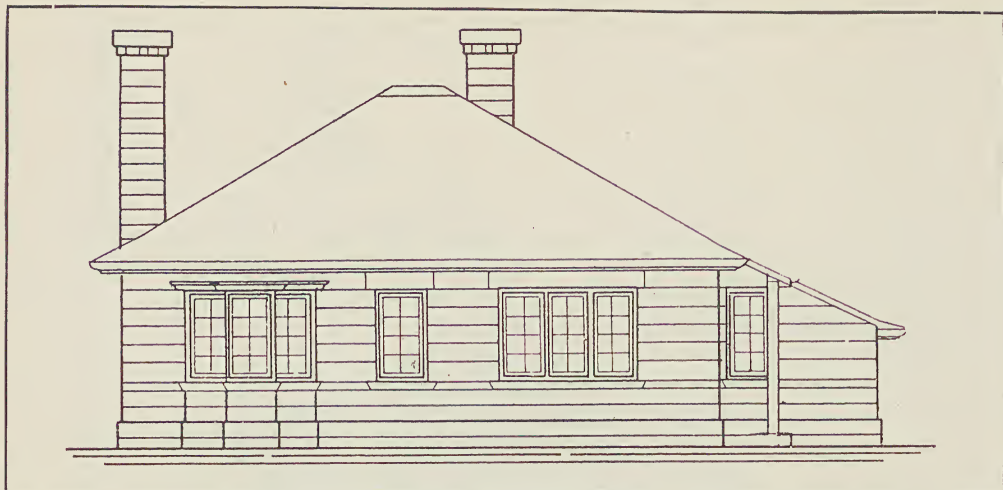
TYPE No. 5: With PITCHED ROOF.
